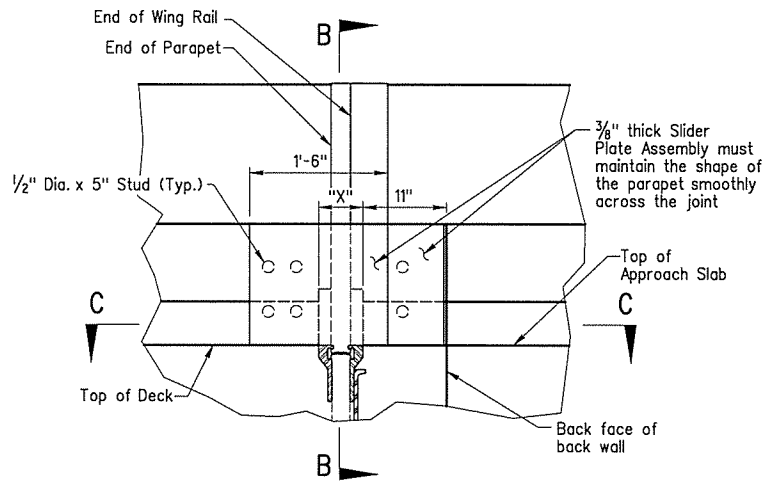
DETAILS FOR BLOCKING EXPANSION JOINT DEVICE
